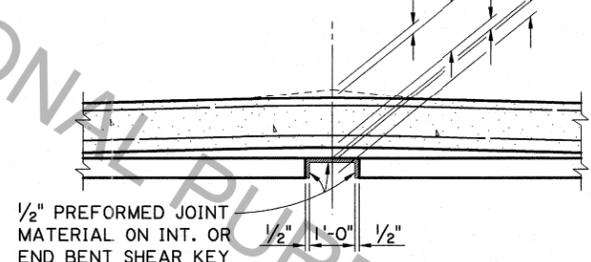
DETAIL SHOWING TYPICAL JOINT & HAUNCH
